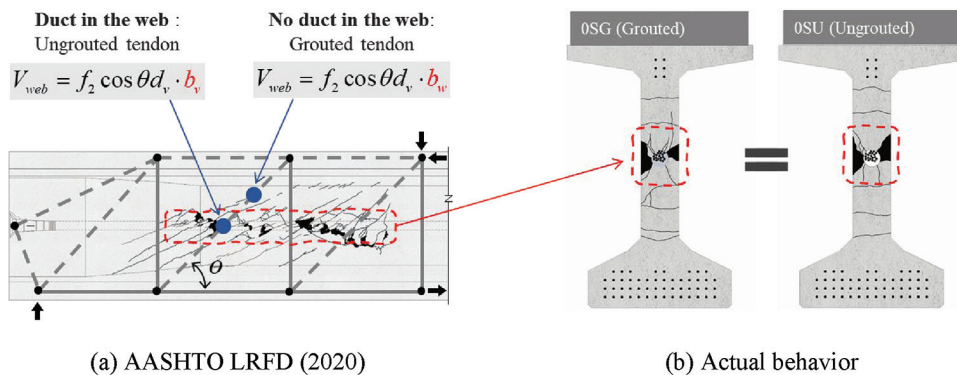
Ultimate failure mode of localized web crushing in specimens with grouted or ungrouted ducts.
